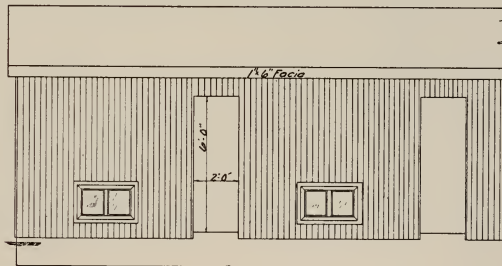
Rear view of breeding house showing location of rear windows and doors. See text for discussion of windows.
